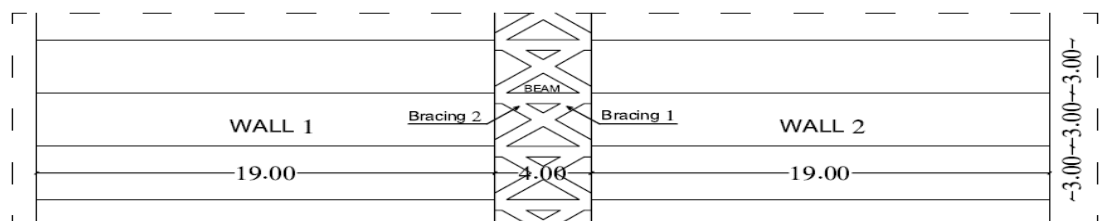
Elevation of coupled shear walls connecting by beams and bracings.
